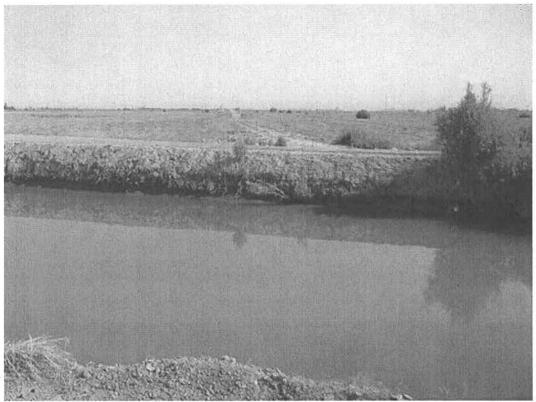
Unpaved farm road north of Dogwood Canal, looking toward Jasper Road.
